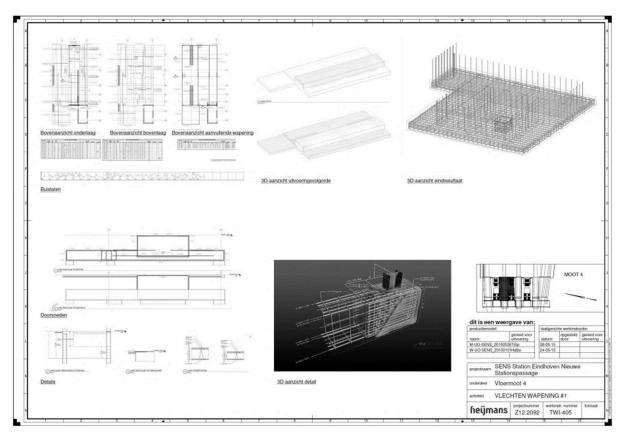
Example TOI placing floor reinforcement (Span, 2015)
